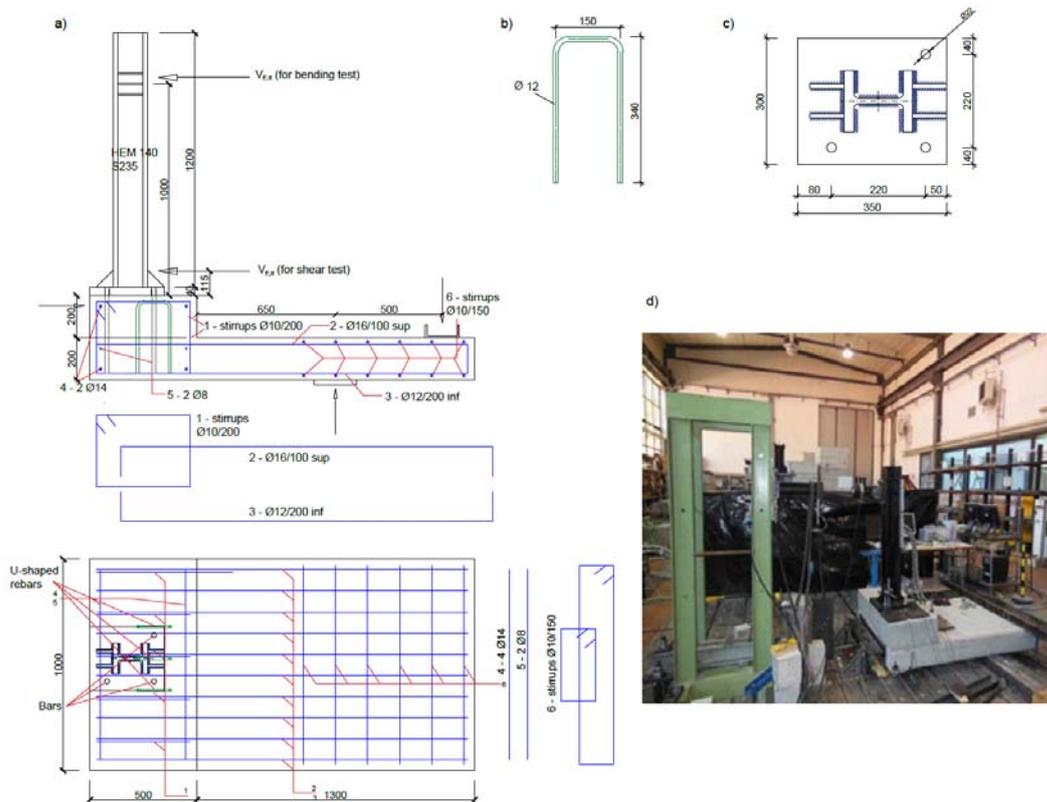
(a) Specimen and test set-up (b) U-shaped rebar (c) steel plate (d) test set-up (measures in mm).
